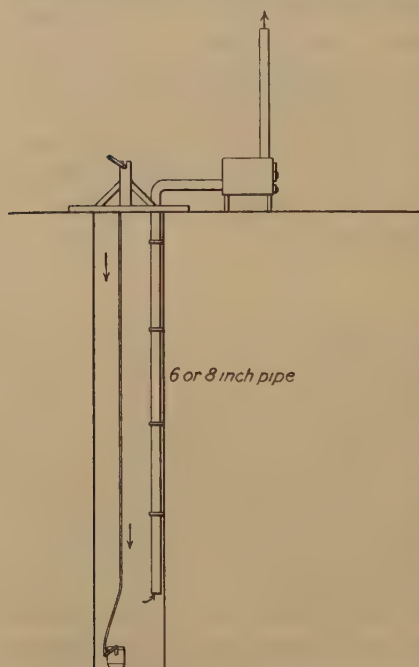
VENTILATING SHALLOW SHAFT WITH STOVE AND PIPE.
